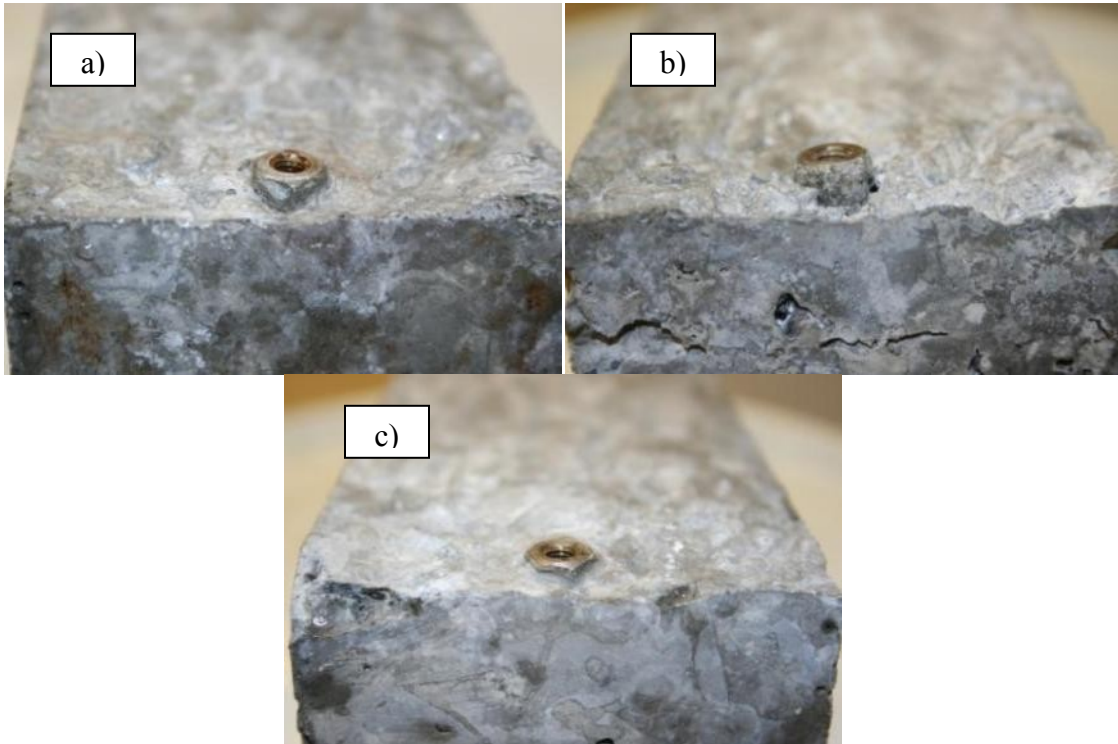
Cast accelerometer attachment for a) Sample 1, b) Sample 2, and c) Sample 3.
